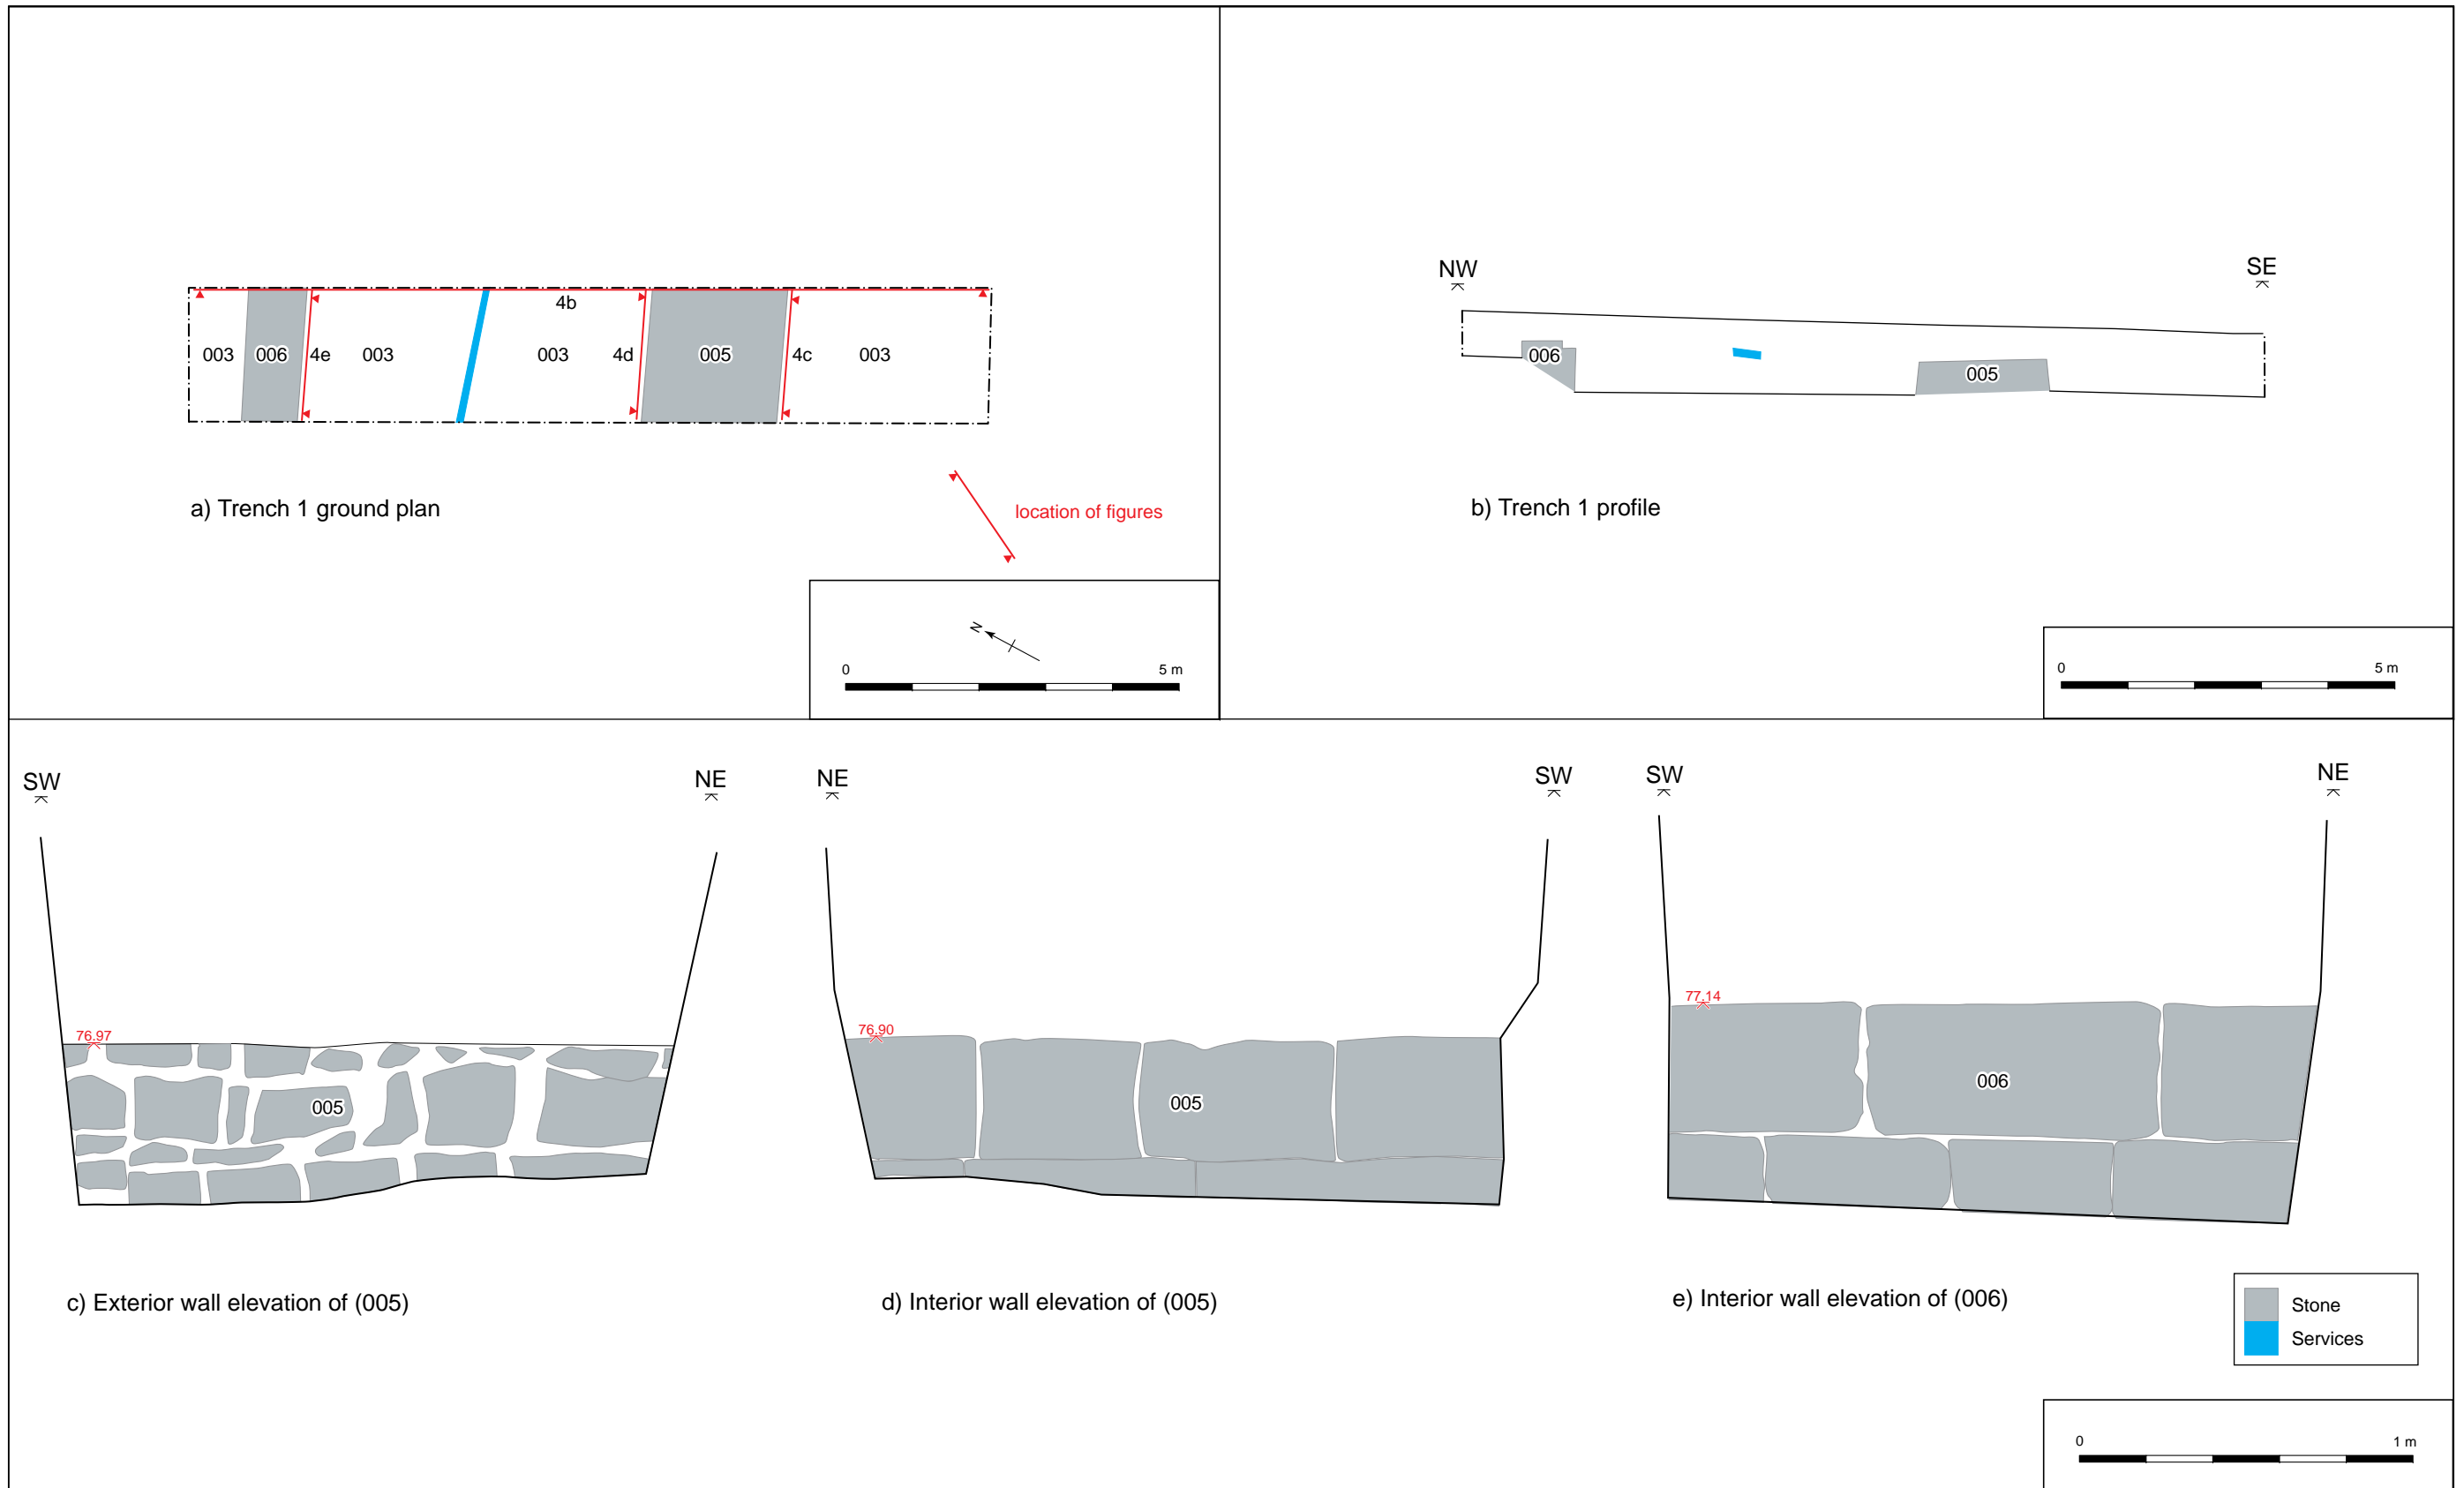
RPA, Luas Line BXD 710: Broadstone, 10E90, a) Trench 1, ground plan, b) Trench 1, profile, c) Trench 1, exterior wall elevation of (005), d) Trench 1, interior wall elevation of (005), e) Trench 1, interior wall elevation of (006)
